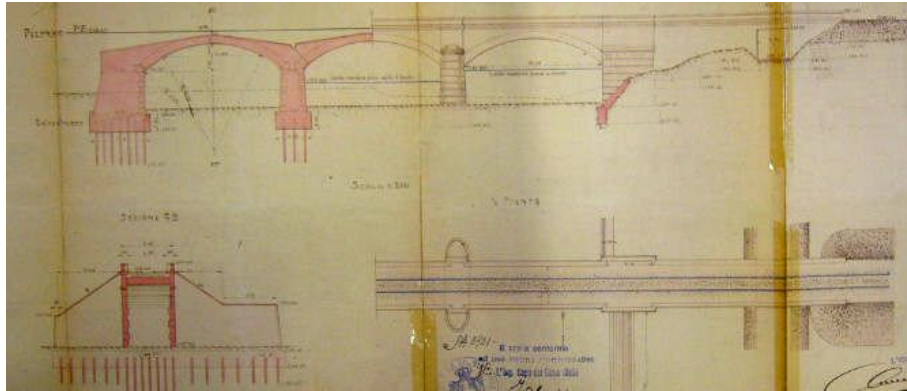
Longitudinal view, cross-section and upper view of Agira River Bridge.
